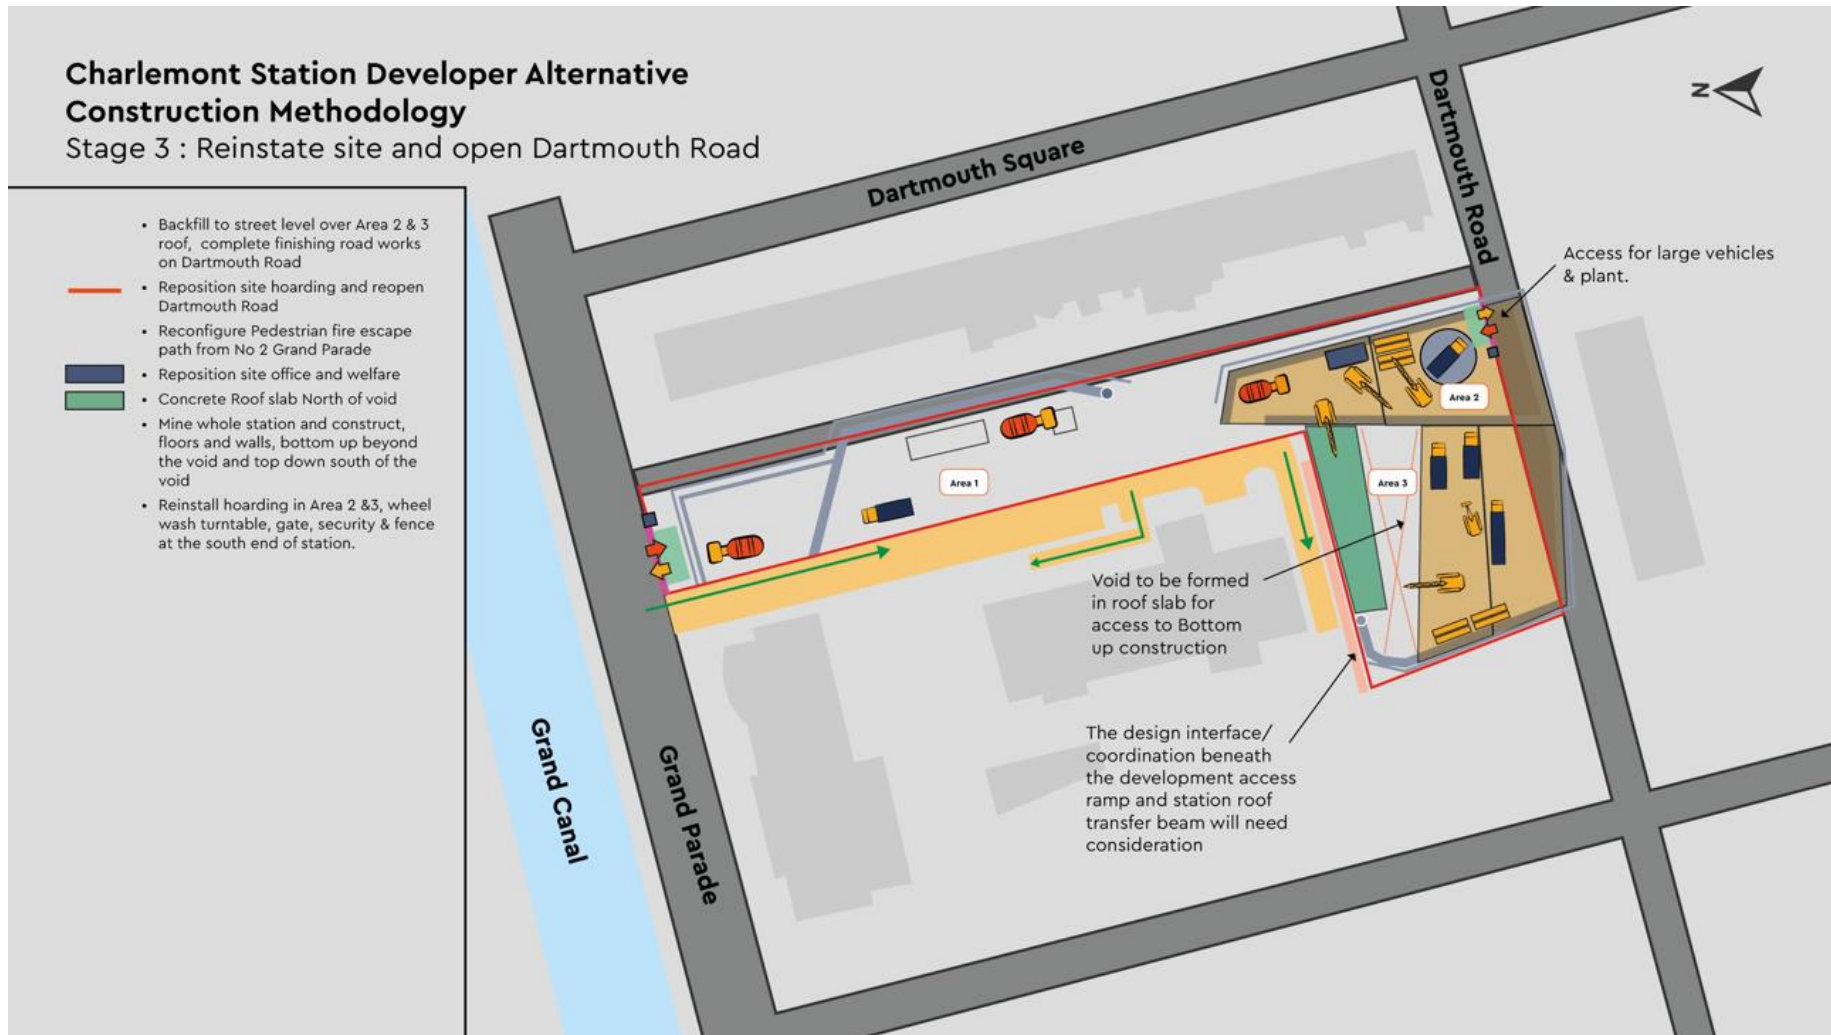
Charlemont Station – Stage 3 – reinststate site and open Dartmouth Road
